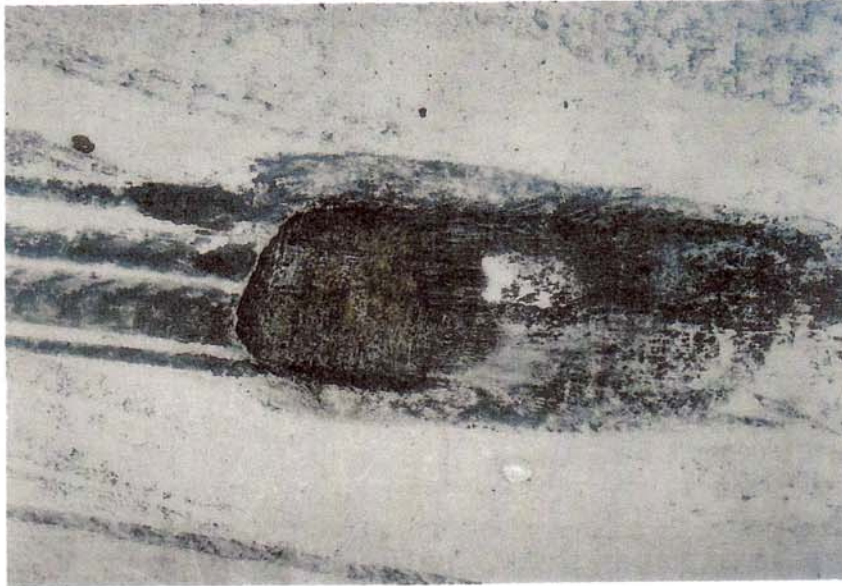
Wear Through from Wheel Spin of Single Vehicle, Willis Street Parking Building
